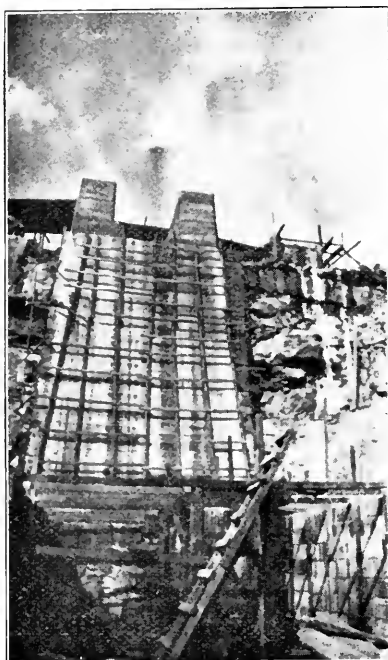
CONCRETE FOUNDATION WITH FORMS STILL IN PLACE.
